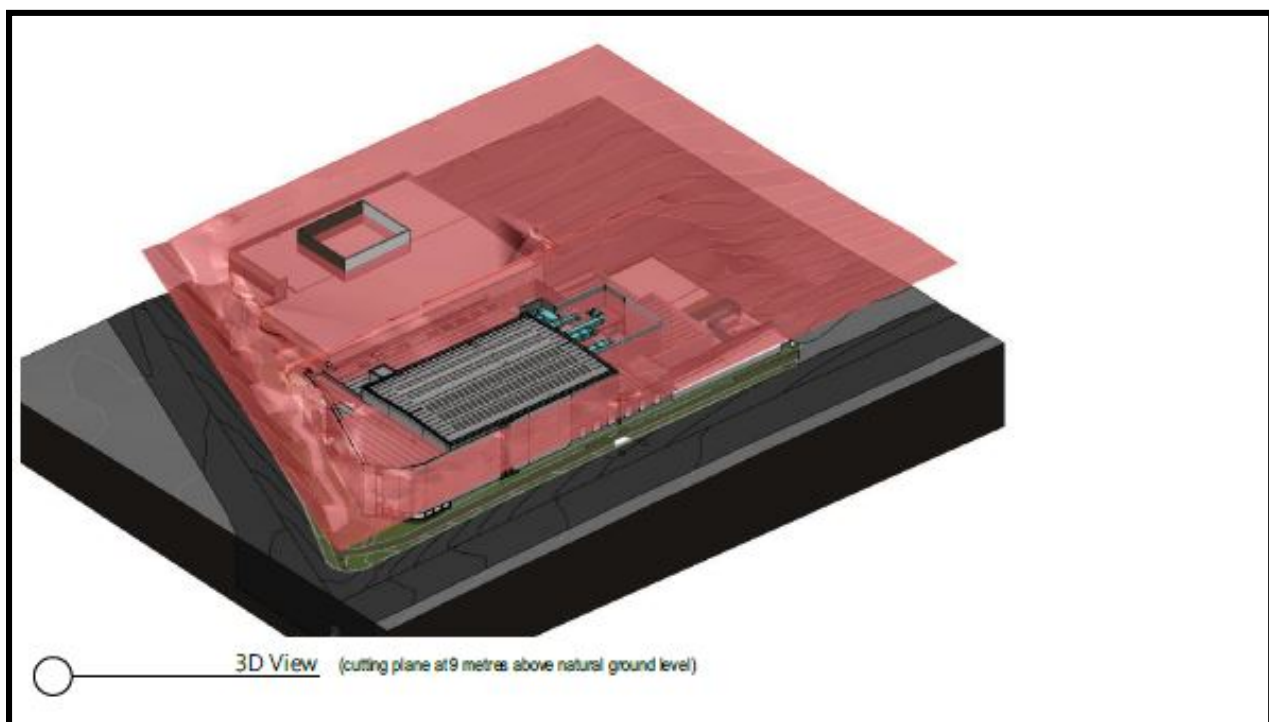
3D Height Plane detailing the height breach (Source: William Ross Architects)
